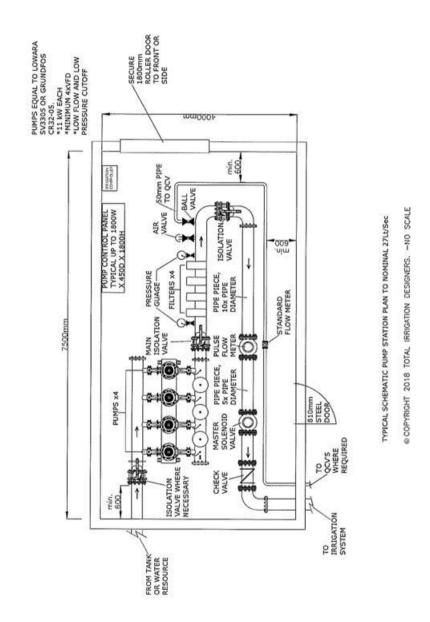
Pump Station Schematic Layout – Flows between 18 to 27 Lt/sec
